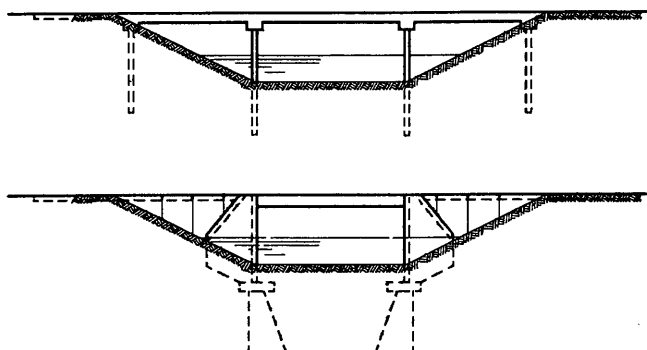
Different bridge types for the same site: (top) multiple-span integral bridge with stub-type abutments; (bottom) single span with movable bearings and wall-type abutments.
